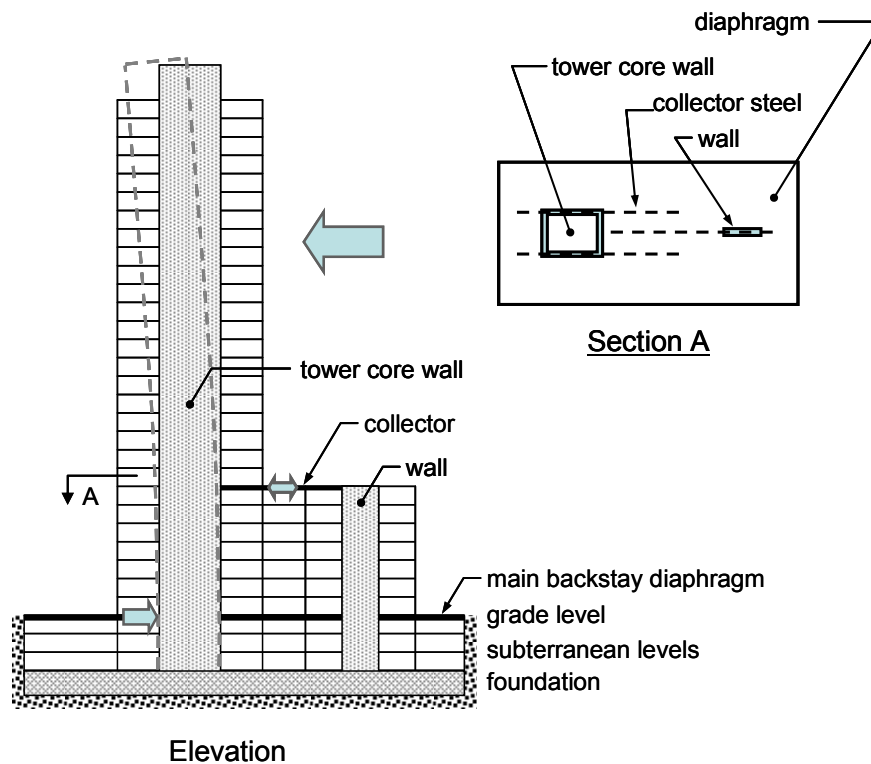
Example of a setback in a concrete core wall building in which an additional concrete wall extends above the lower podium, but not the full height of the building.
